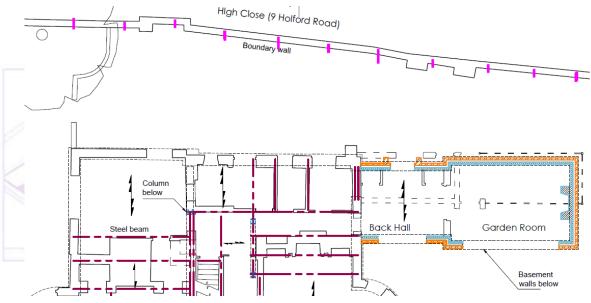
Extract from Ground Floor Plan with proposed monitoring locations indicated in pink
